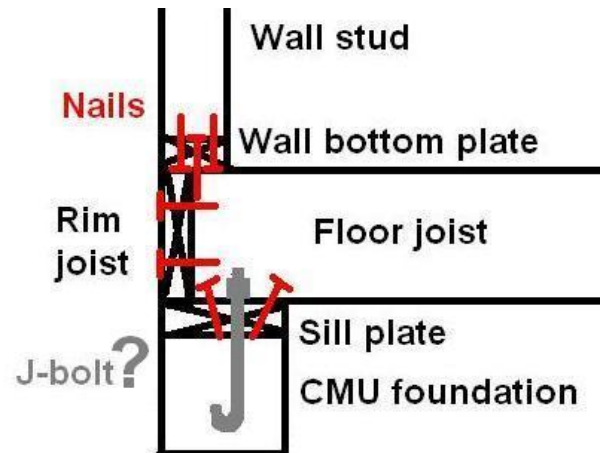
Typical cross section of the base of a house supported on a CMU foundation. Nails are indicated in red. J-bolts were rarely used to attach the sill plates to the foundations.
